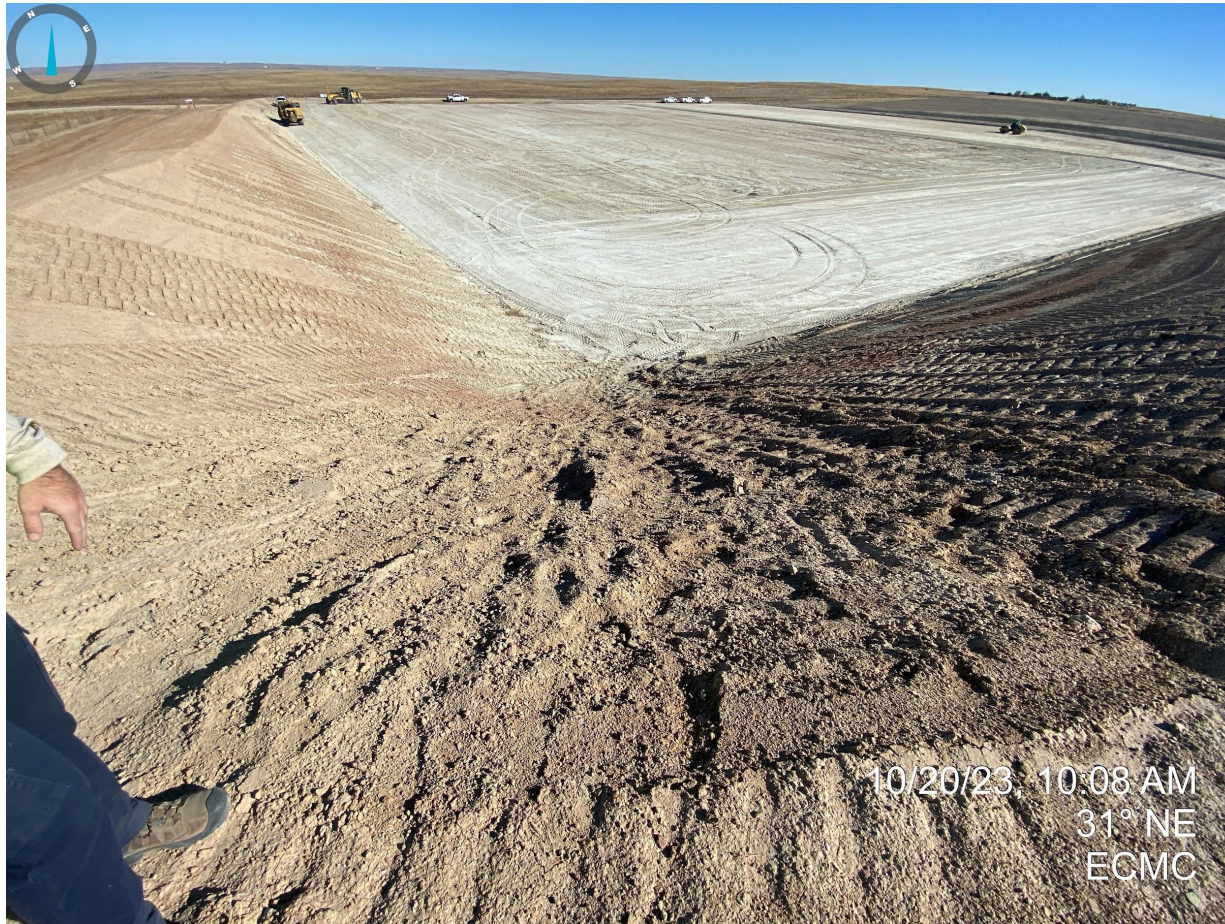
Taken from the southwest corner of the production area. Photo illustrates that some erosion degradation has been repaired since previously documented. Additional stormwater control measures/soil stabilization is required due to the steep topography and probability of further erosion degradation.
